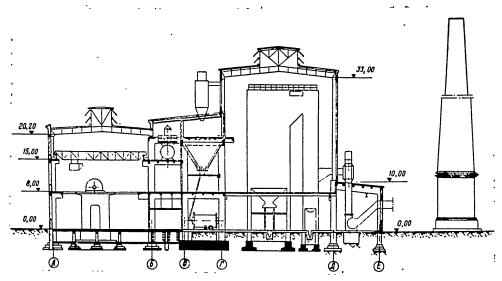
Frame construction in precsst reinforced concrete and steel.
